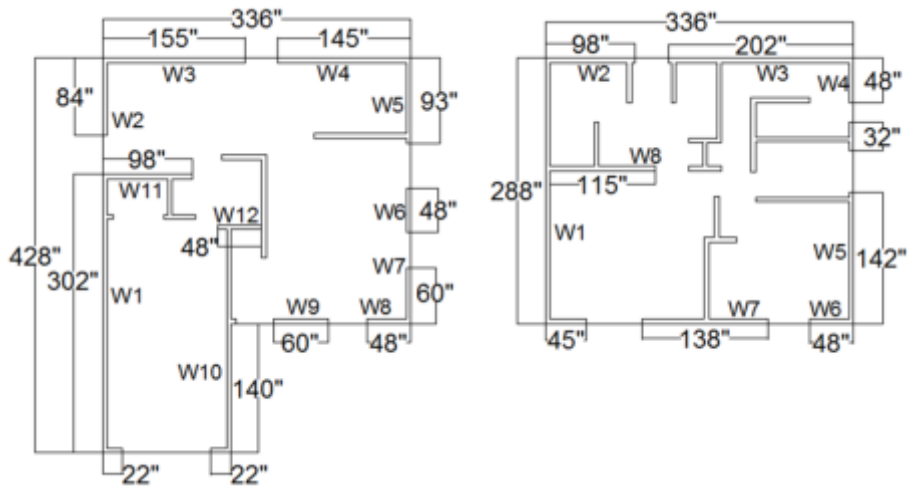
Floor Plan 6 - Two-Story House with a Garage
